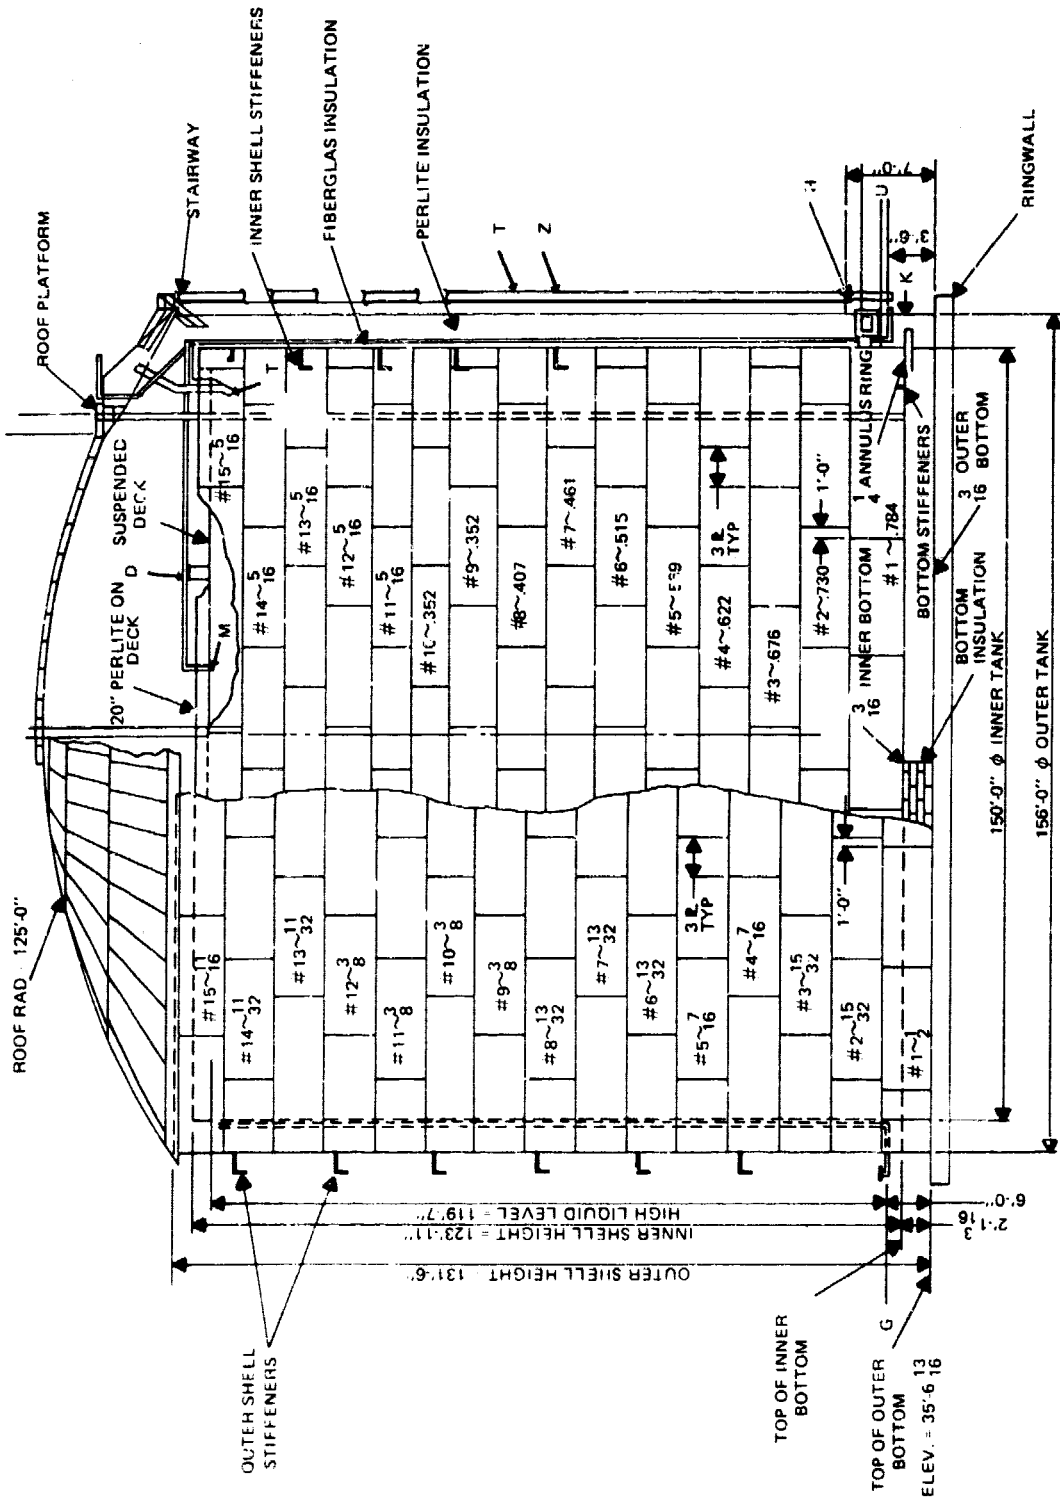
ELEVATION VIEW OF A TYPICAL DOUBLE WALLED LNG STORAGE TANK OF THE TYPE BUILT BY CB&I FOR DISTRIGAS IN EVERETT, MASS.
